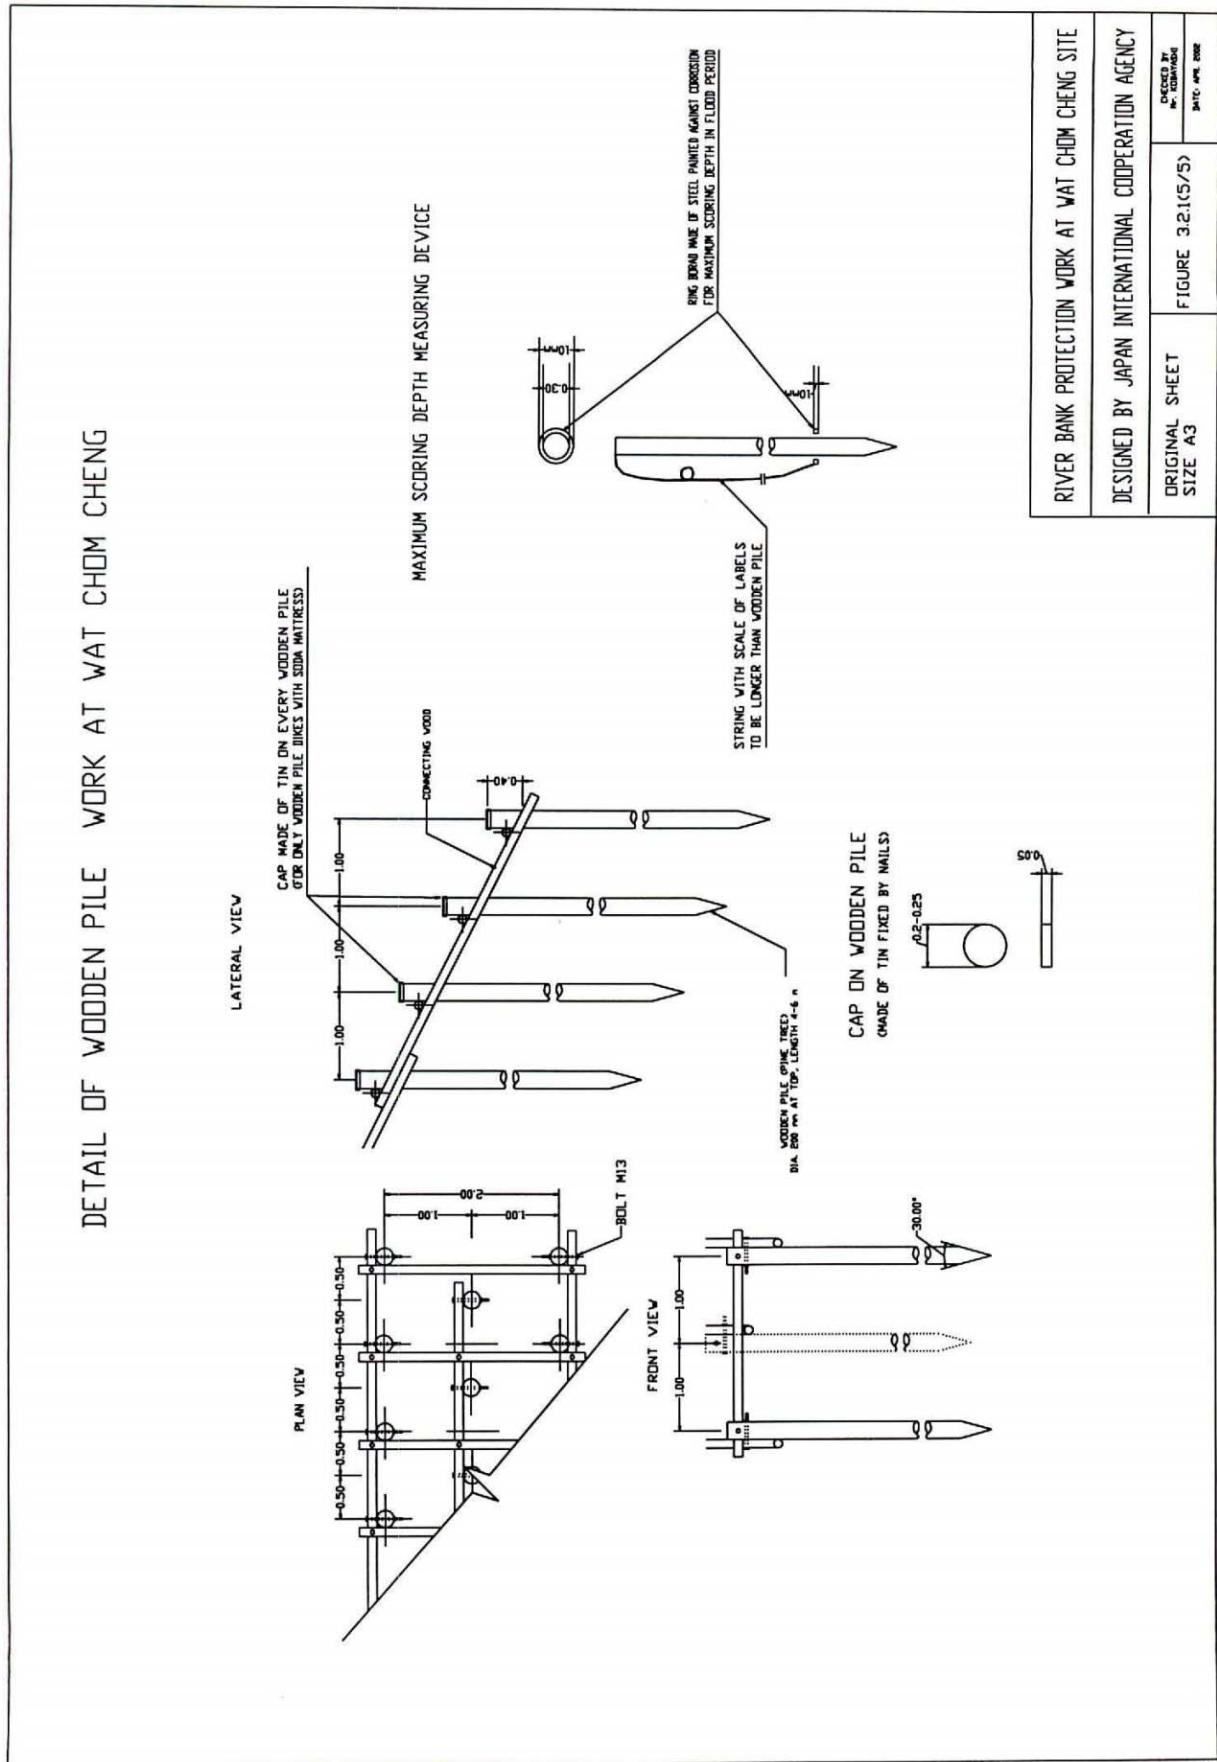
Detail of Wooden Pile Work at Wat Chom Cheng Site
